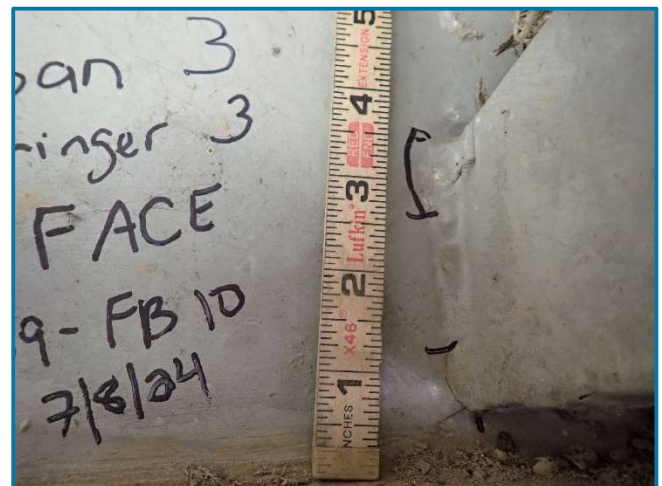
Crack in weld for 2/3 of length on Stringer 3 connection to diaphragm between Floorbeam 9 and 10, looking north
